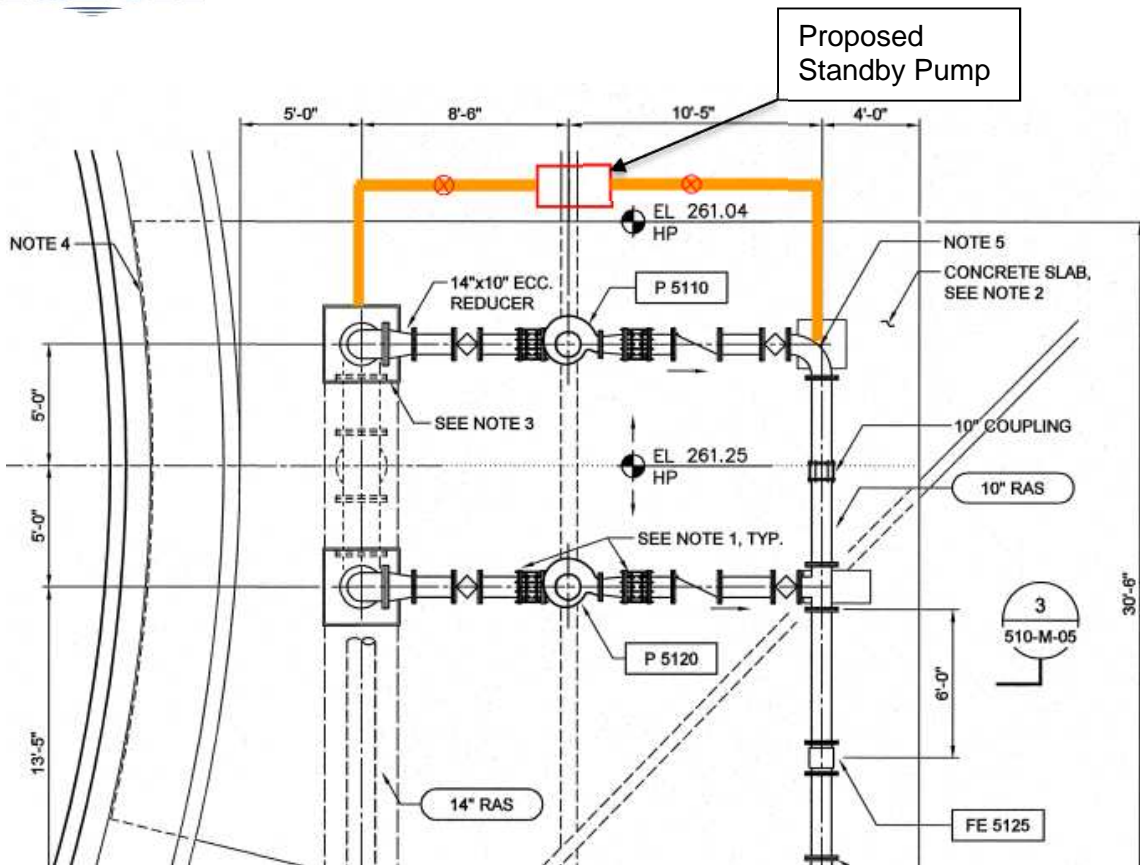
Proposed Standby RAS Pump and Piping for Clarifier 1
